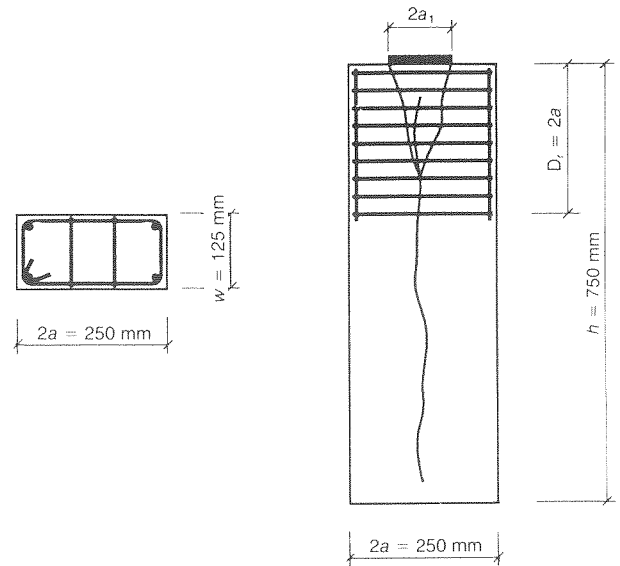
Overall arrangement of the test specimens, showing typical steel reinforcement and final wedging failure
